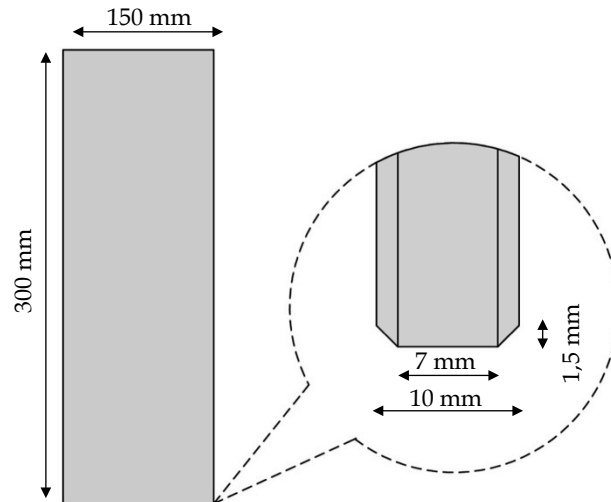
Compression test specimen geometry and detail of the glass bevelled polished edge.
